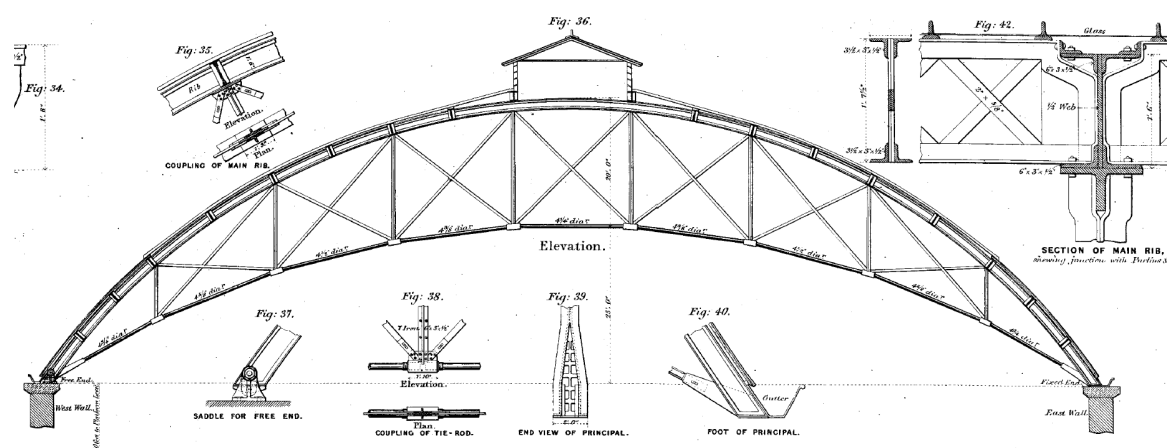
Charing Cross Station roof truss (Barry 1868)
